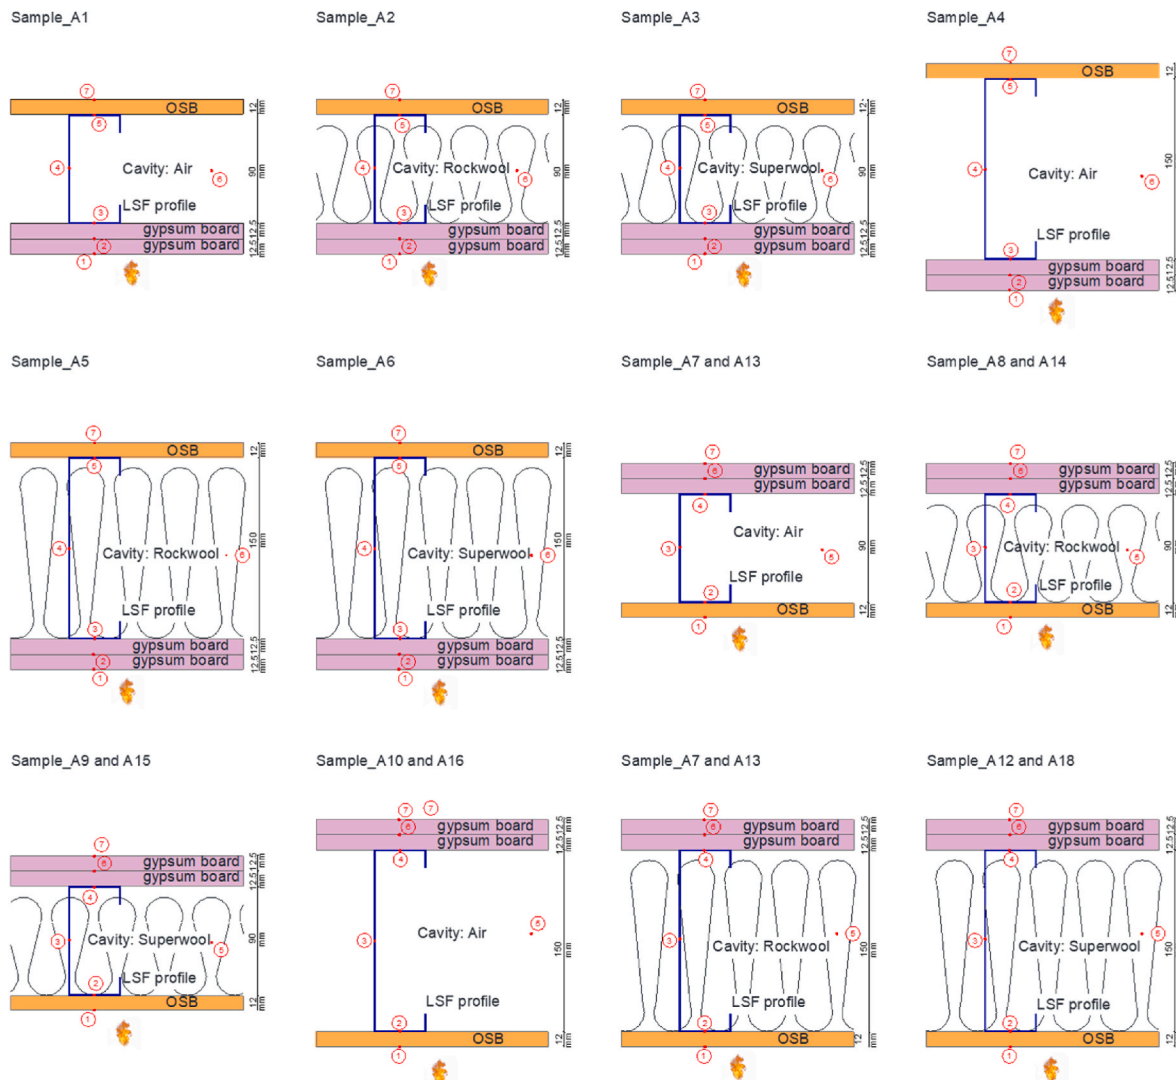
Samples of external walls and fire heating conditions – LSF stud profiles 90 and 150 mm.
